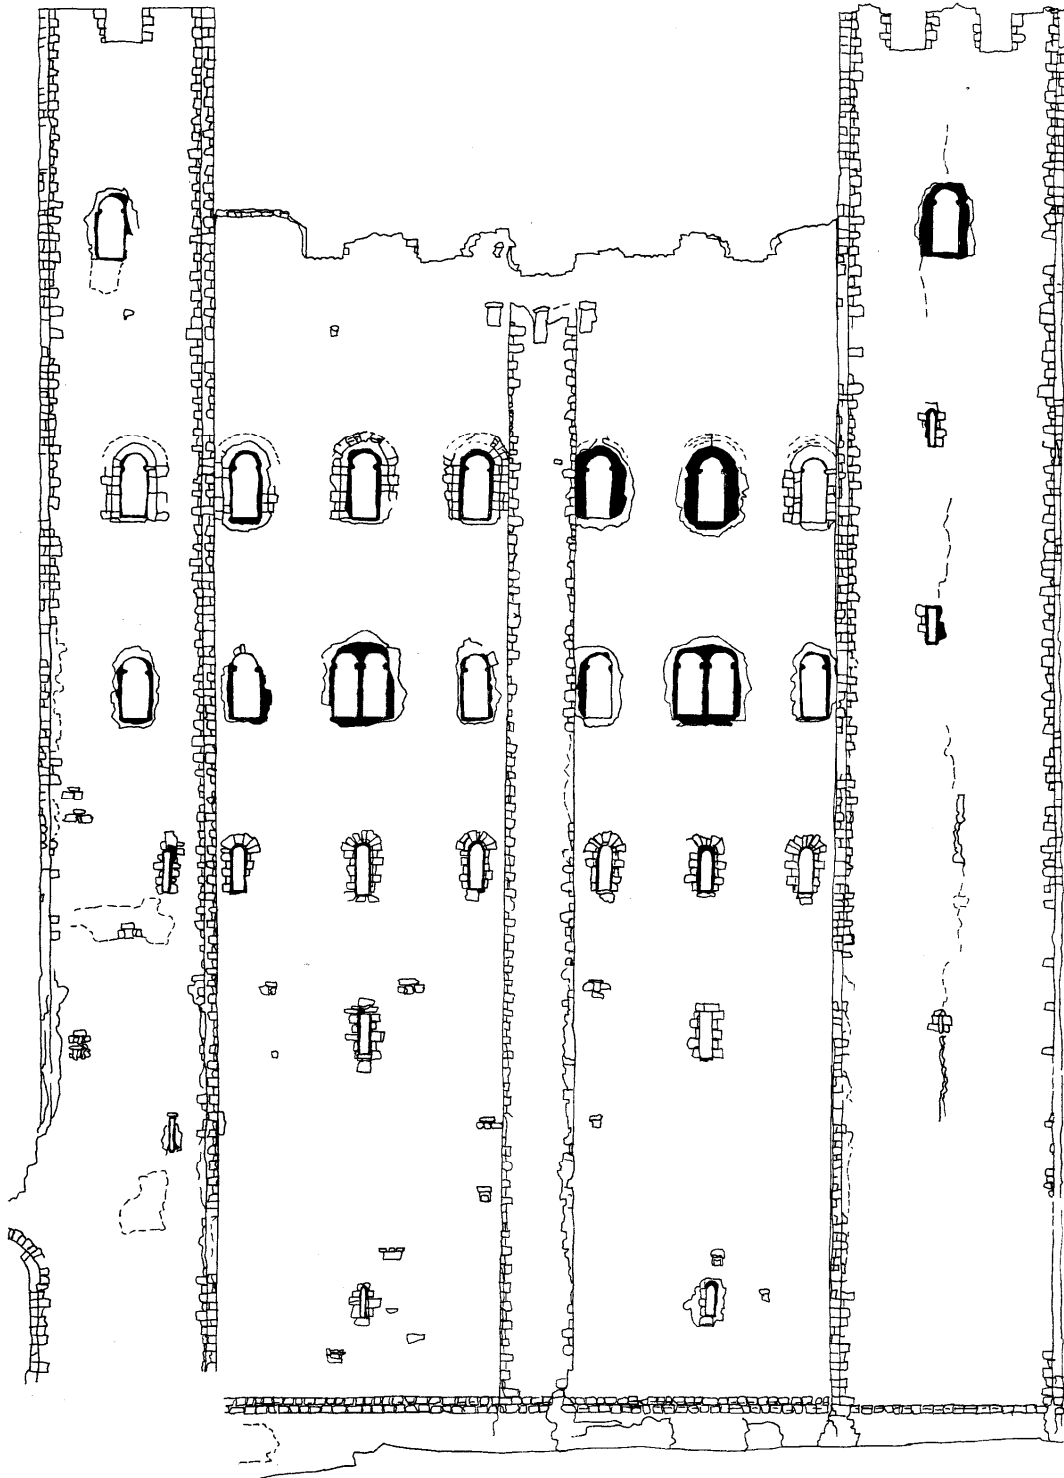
Reconstruction of the west elevation with window outlines reinstated
